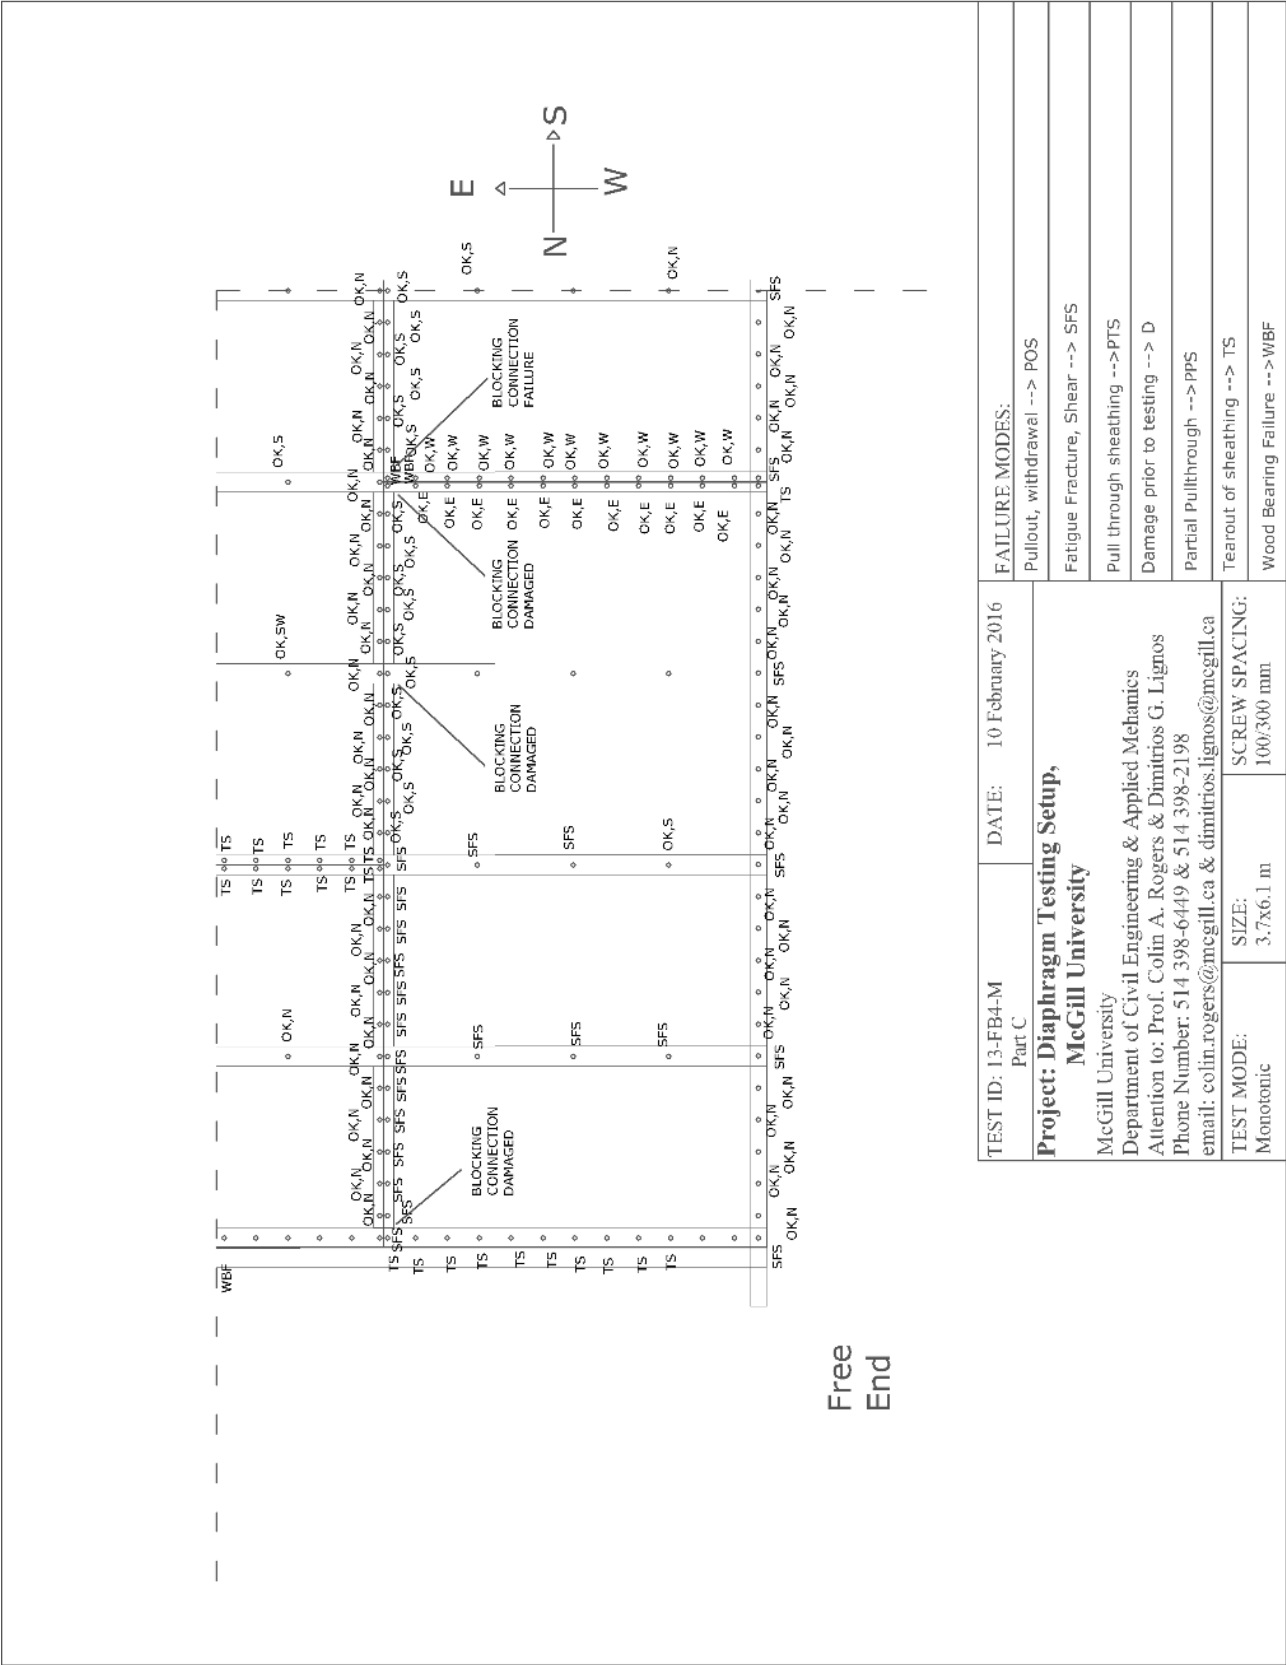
Sheathing Fastener Failure Modes Part C Specimen 13-FB4-M
